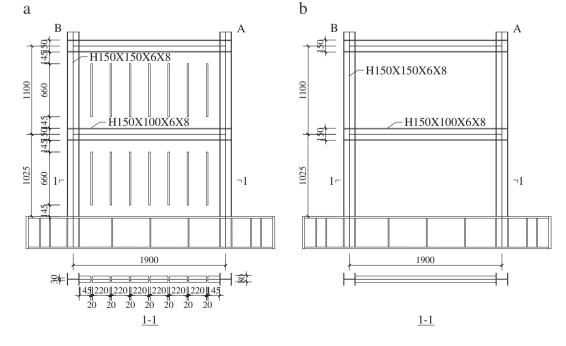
Dimensions of specimen: (a) specimen no. 1; (b) specimen no. 2 (dimension in mm).
